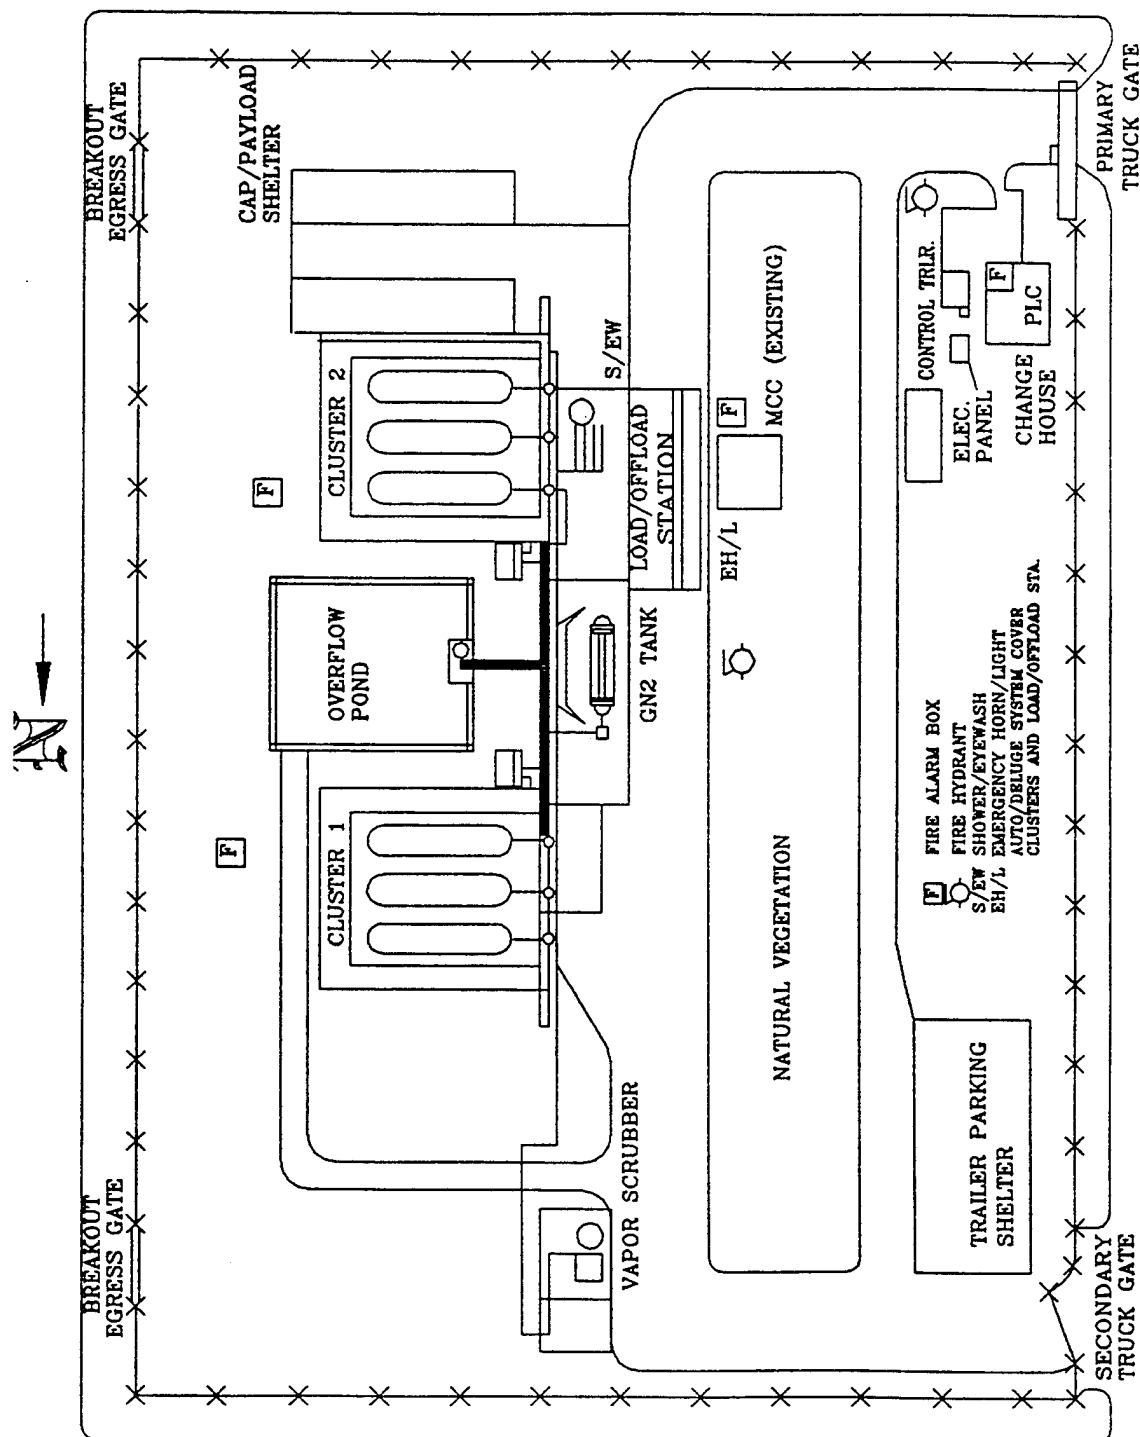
VAFB HSF Fuel Facility Site Plan.
